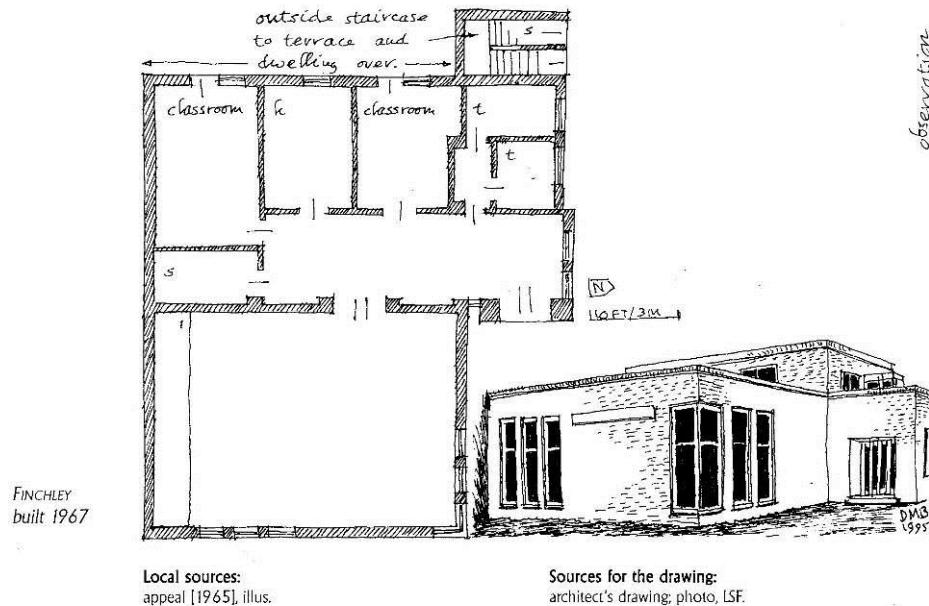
The plan of the building, with a perspective sketch, *Butler*, vol.1 p.391.
